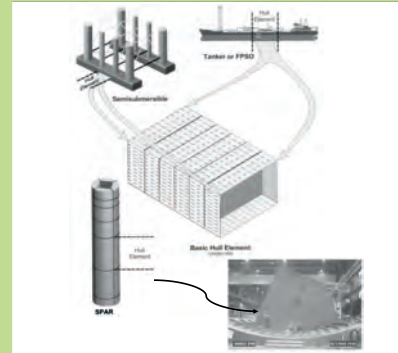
Main structural elements in floating structures (stiffened steel shells).
